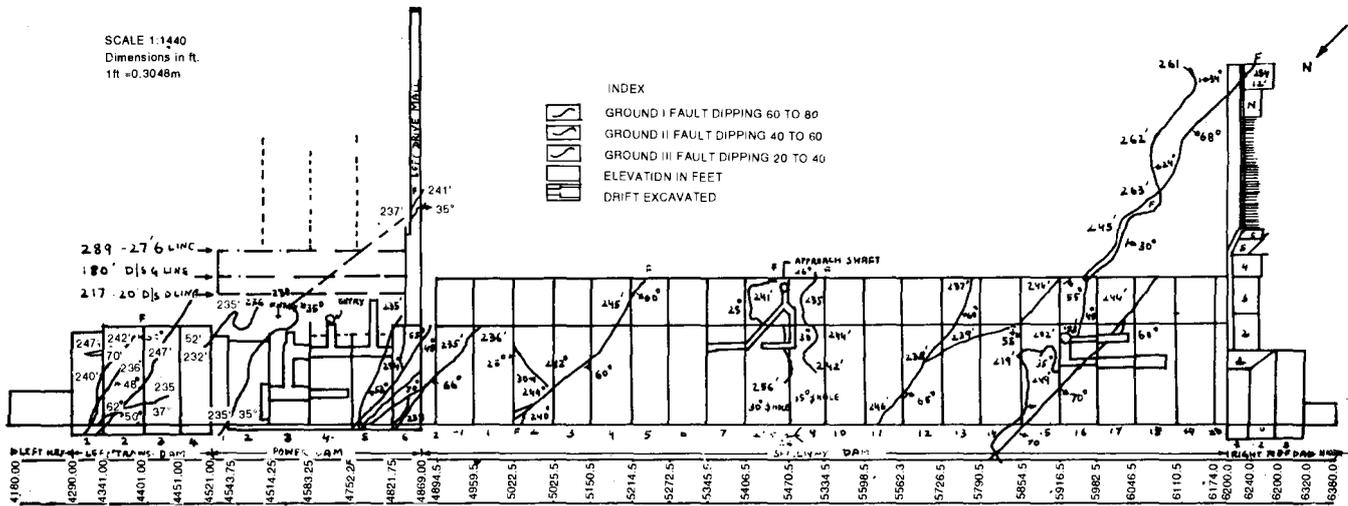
Kadana Reservoir Project, Plan showing the disposition of faults in the foundations of masonry dam and appurtenant structures
